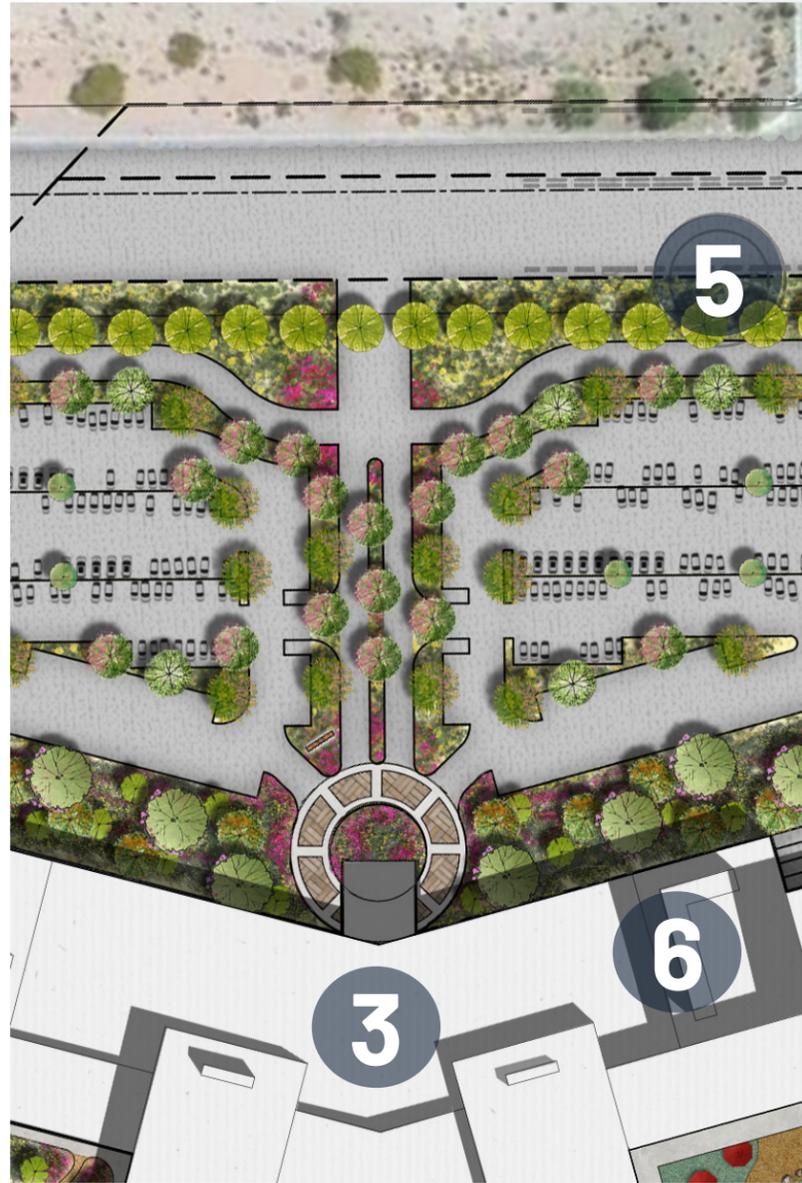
EXHIBIT C: SITE PLANNING AND BUILDING ORIENTATION
